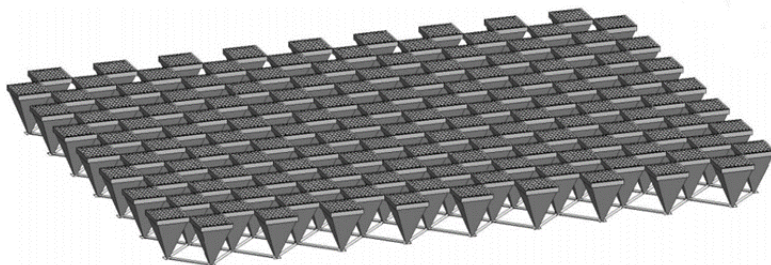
Information model of a structural roof with pyramidal elements facing downwards and a stretched steel pipe belt
